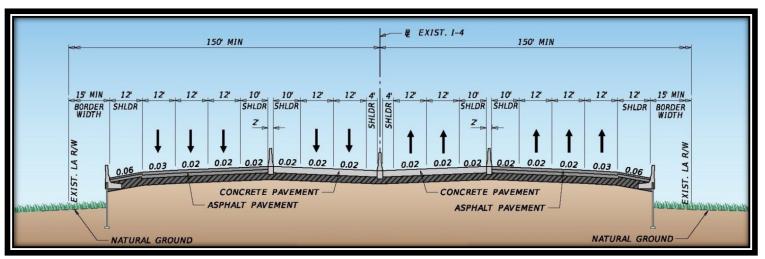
Proposed Typical Section (6+4 without rail envelope) – SR 528 to W. of SR 435
